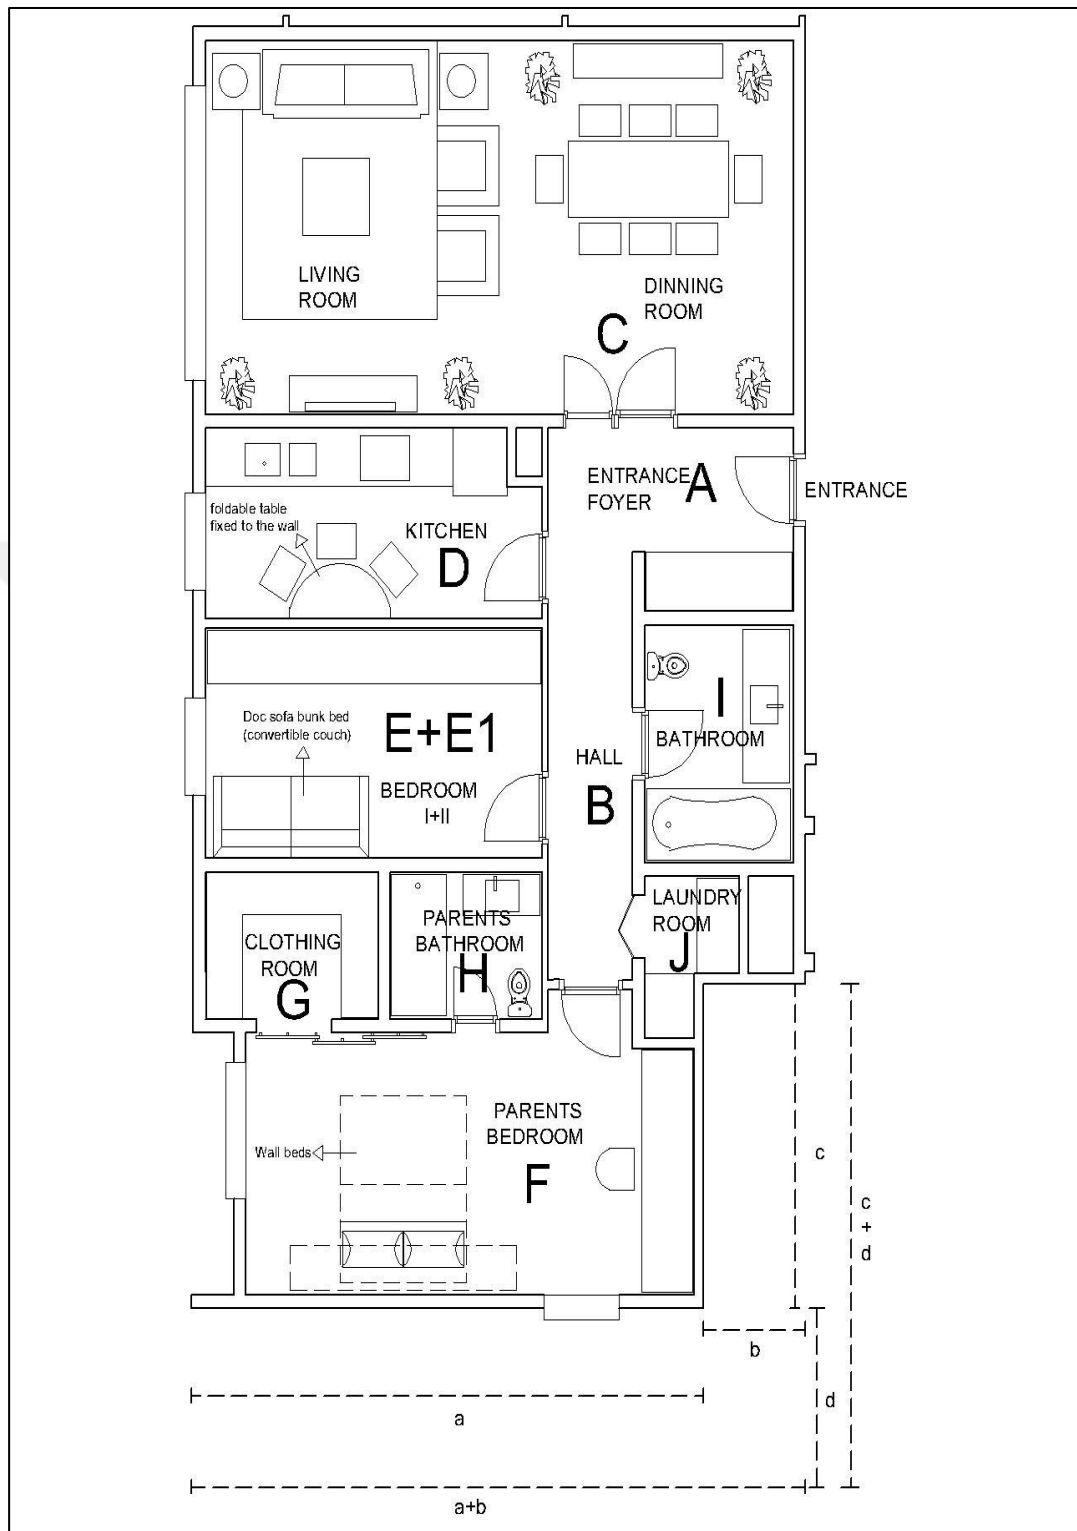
Primary conversion plan of apartment floor plan, designed by author.
